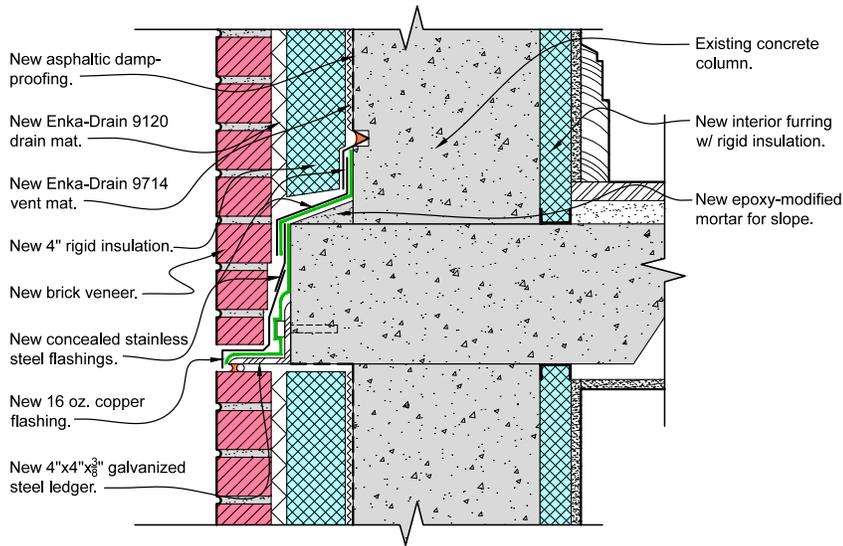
(12): Option 2 New Masonry Veneer Appr. at Typ. Floor-Level Ledger
